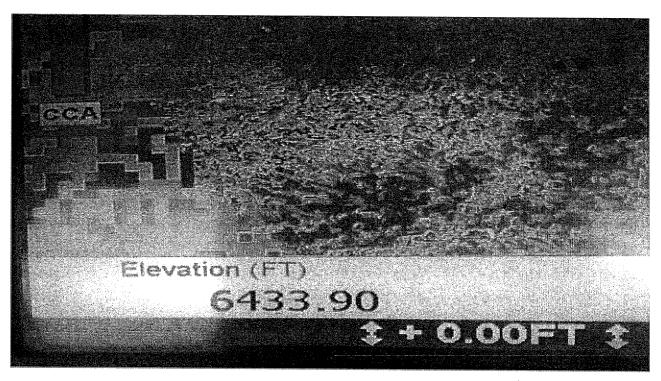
View of Trimble/GPS unit on Compactor Bottom of Lift. Photo taken 12/13/2018.
